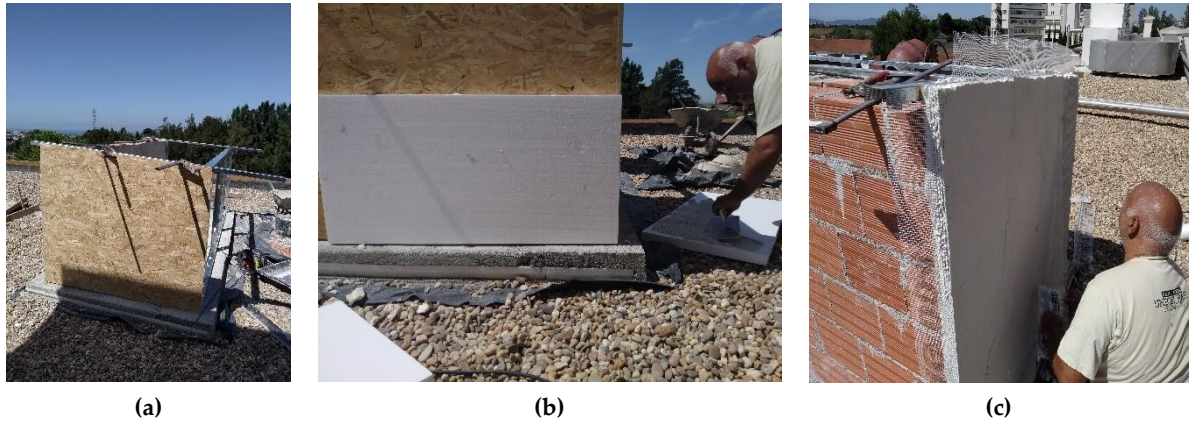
East-facing wall: (a) OSB layer; (b) application of the EPS layer; (c) finishing the application of the EPS layer.
